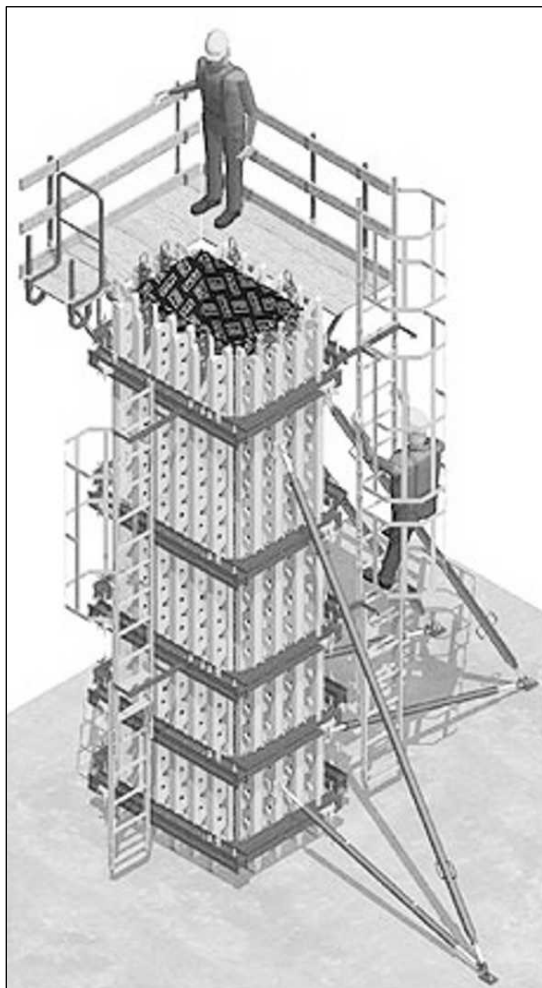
Vario GT 24 Column Formwork (Courtesy PERI).
